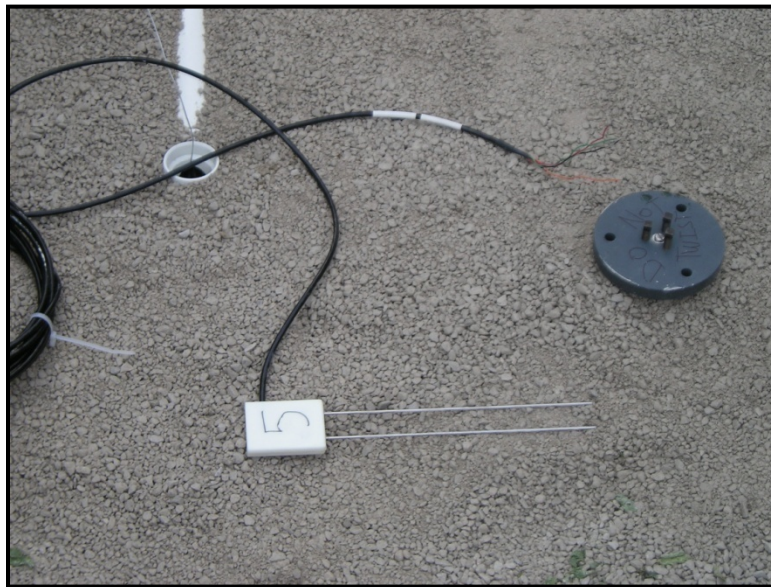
TDR moisture sensor used in instrumenting all trenches
